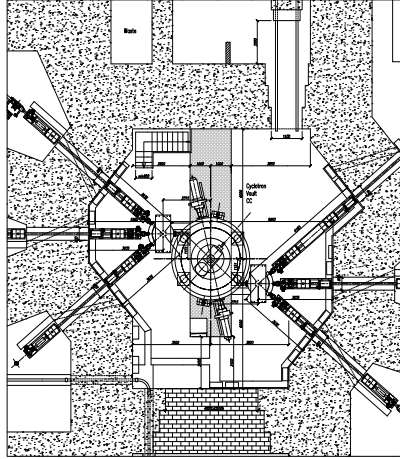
Cyclone® 70 vault dimensions and equipment entry clearance
